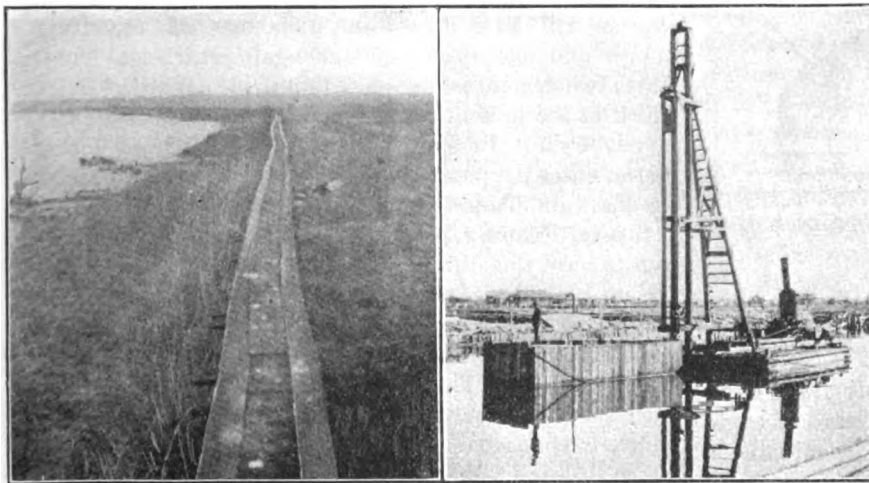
INTERLOCKING WOOD SHEET PILING USED FOR THE CUTOFF UNDER A LEVEE AND FOR A BRIDGE CAISSON
